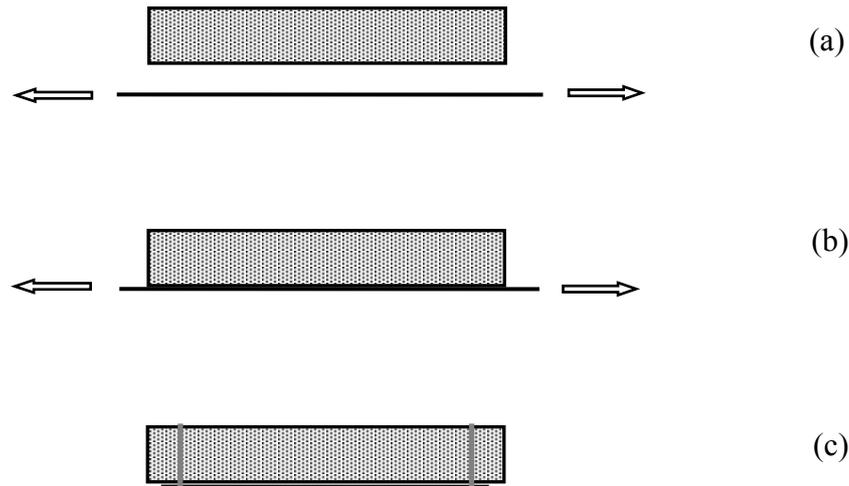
Strengthening with prestressed FRP strips: (a) prestressing; (b) bonding; (c) end anchorage and FRP release upon hardening of the adhesive.
